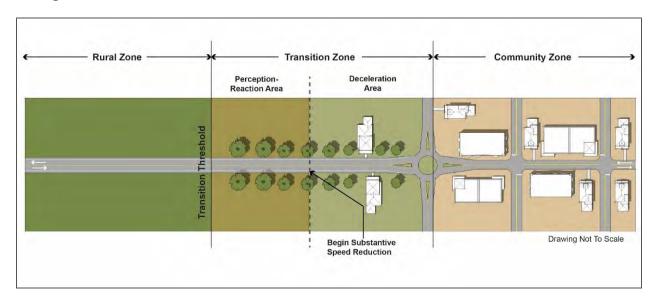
Example of Transition Zone (SR 26 through Newberry, FL)
